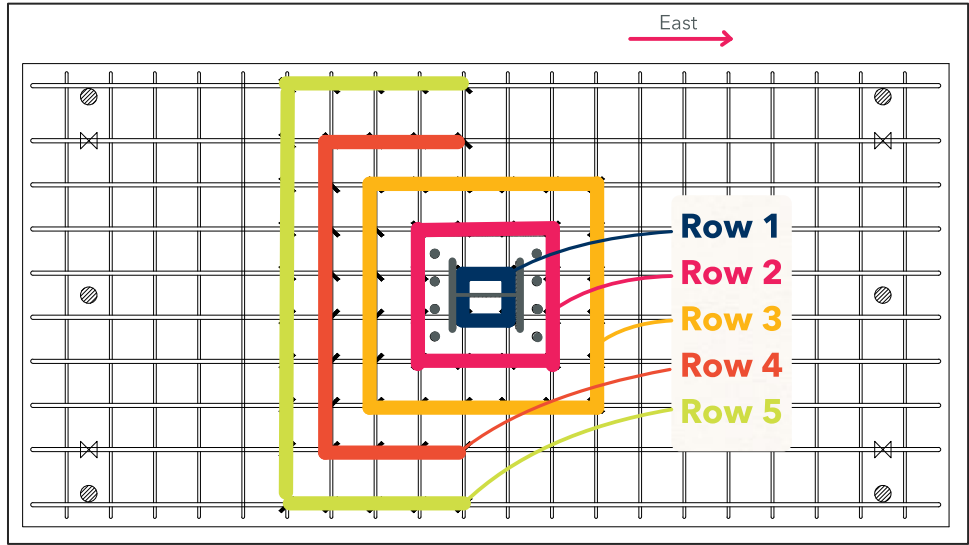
Specimen M02 plan view separating the shear reinforcing bars into rows
